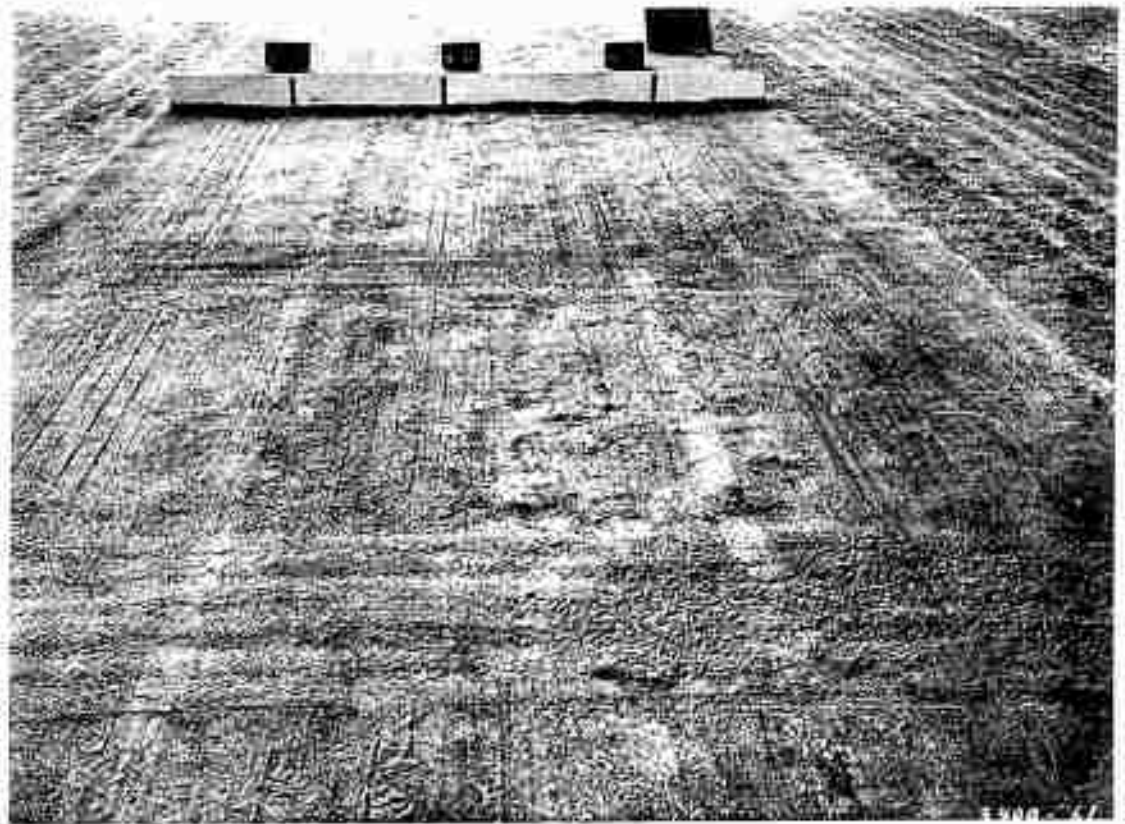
Complete failure of lanes B and C, section II, after 400 applications of traffic
